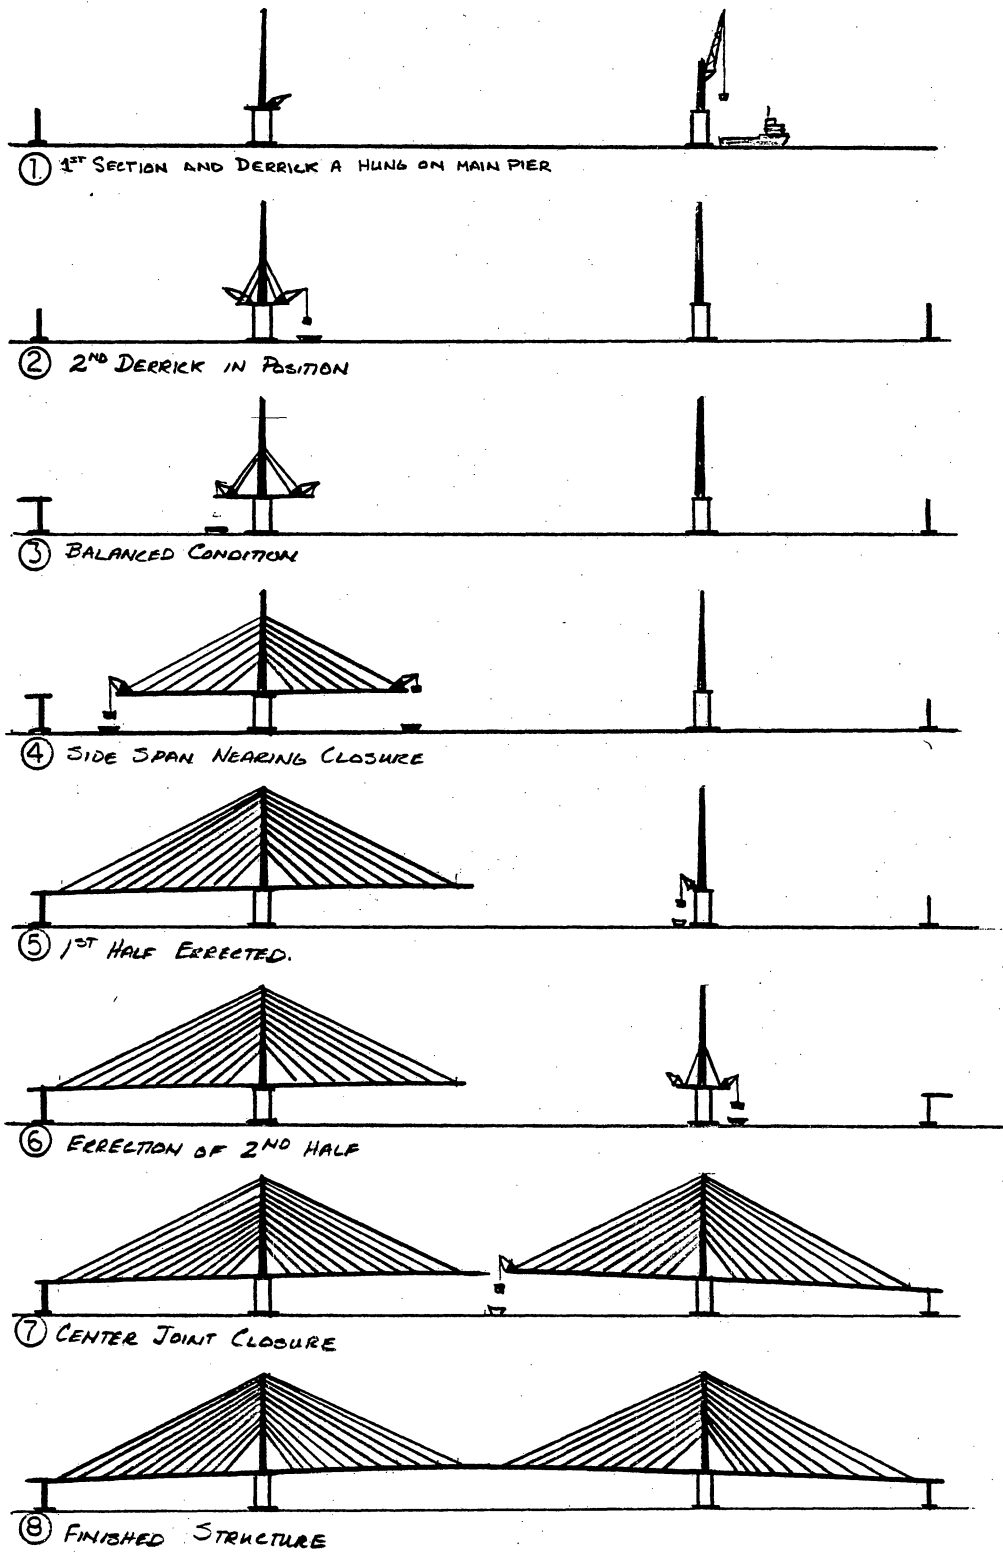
Balanced cantilever construction of a cable-stayed bridge
